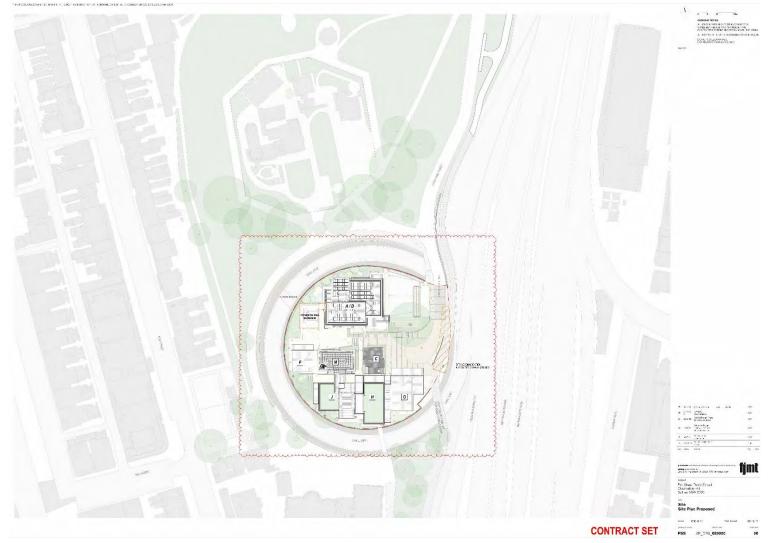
Site Plan proposed. (Source: Lendlease, 2021)
